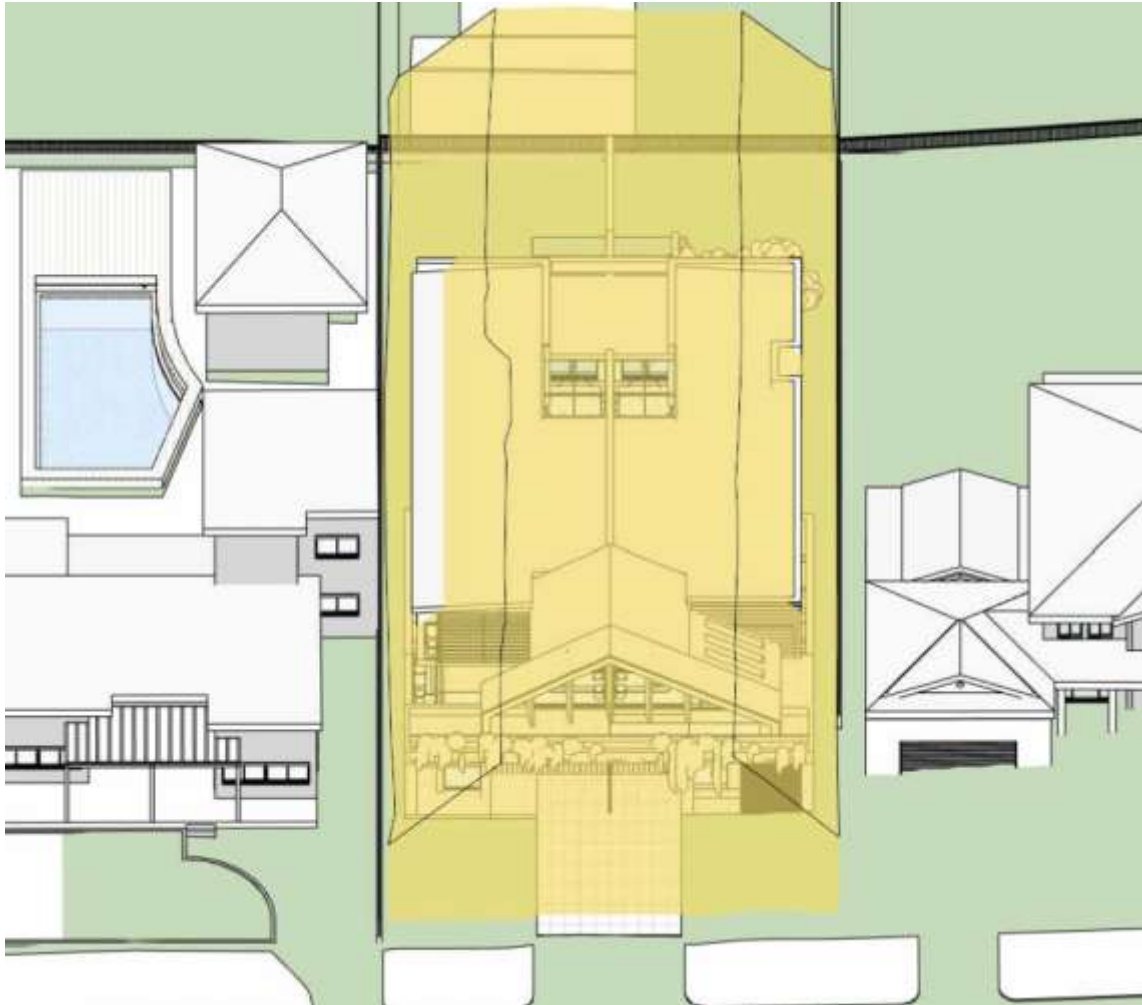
Axonometric view of the proposed development relative to the building height plane (Source: Aform Architecture, 2025.)
